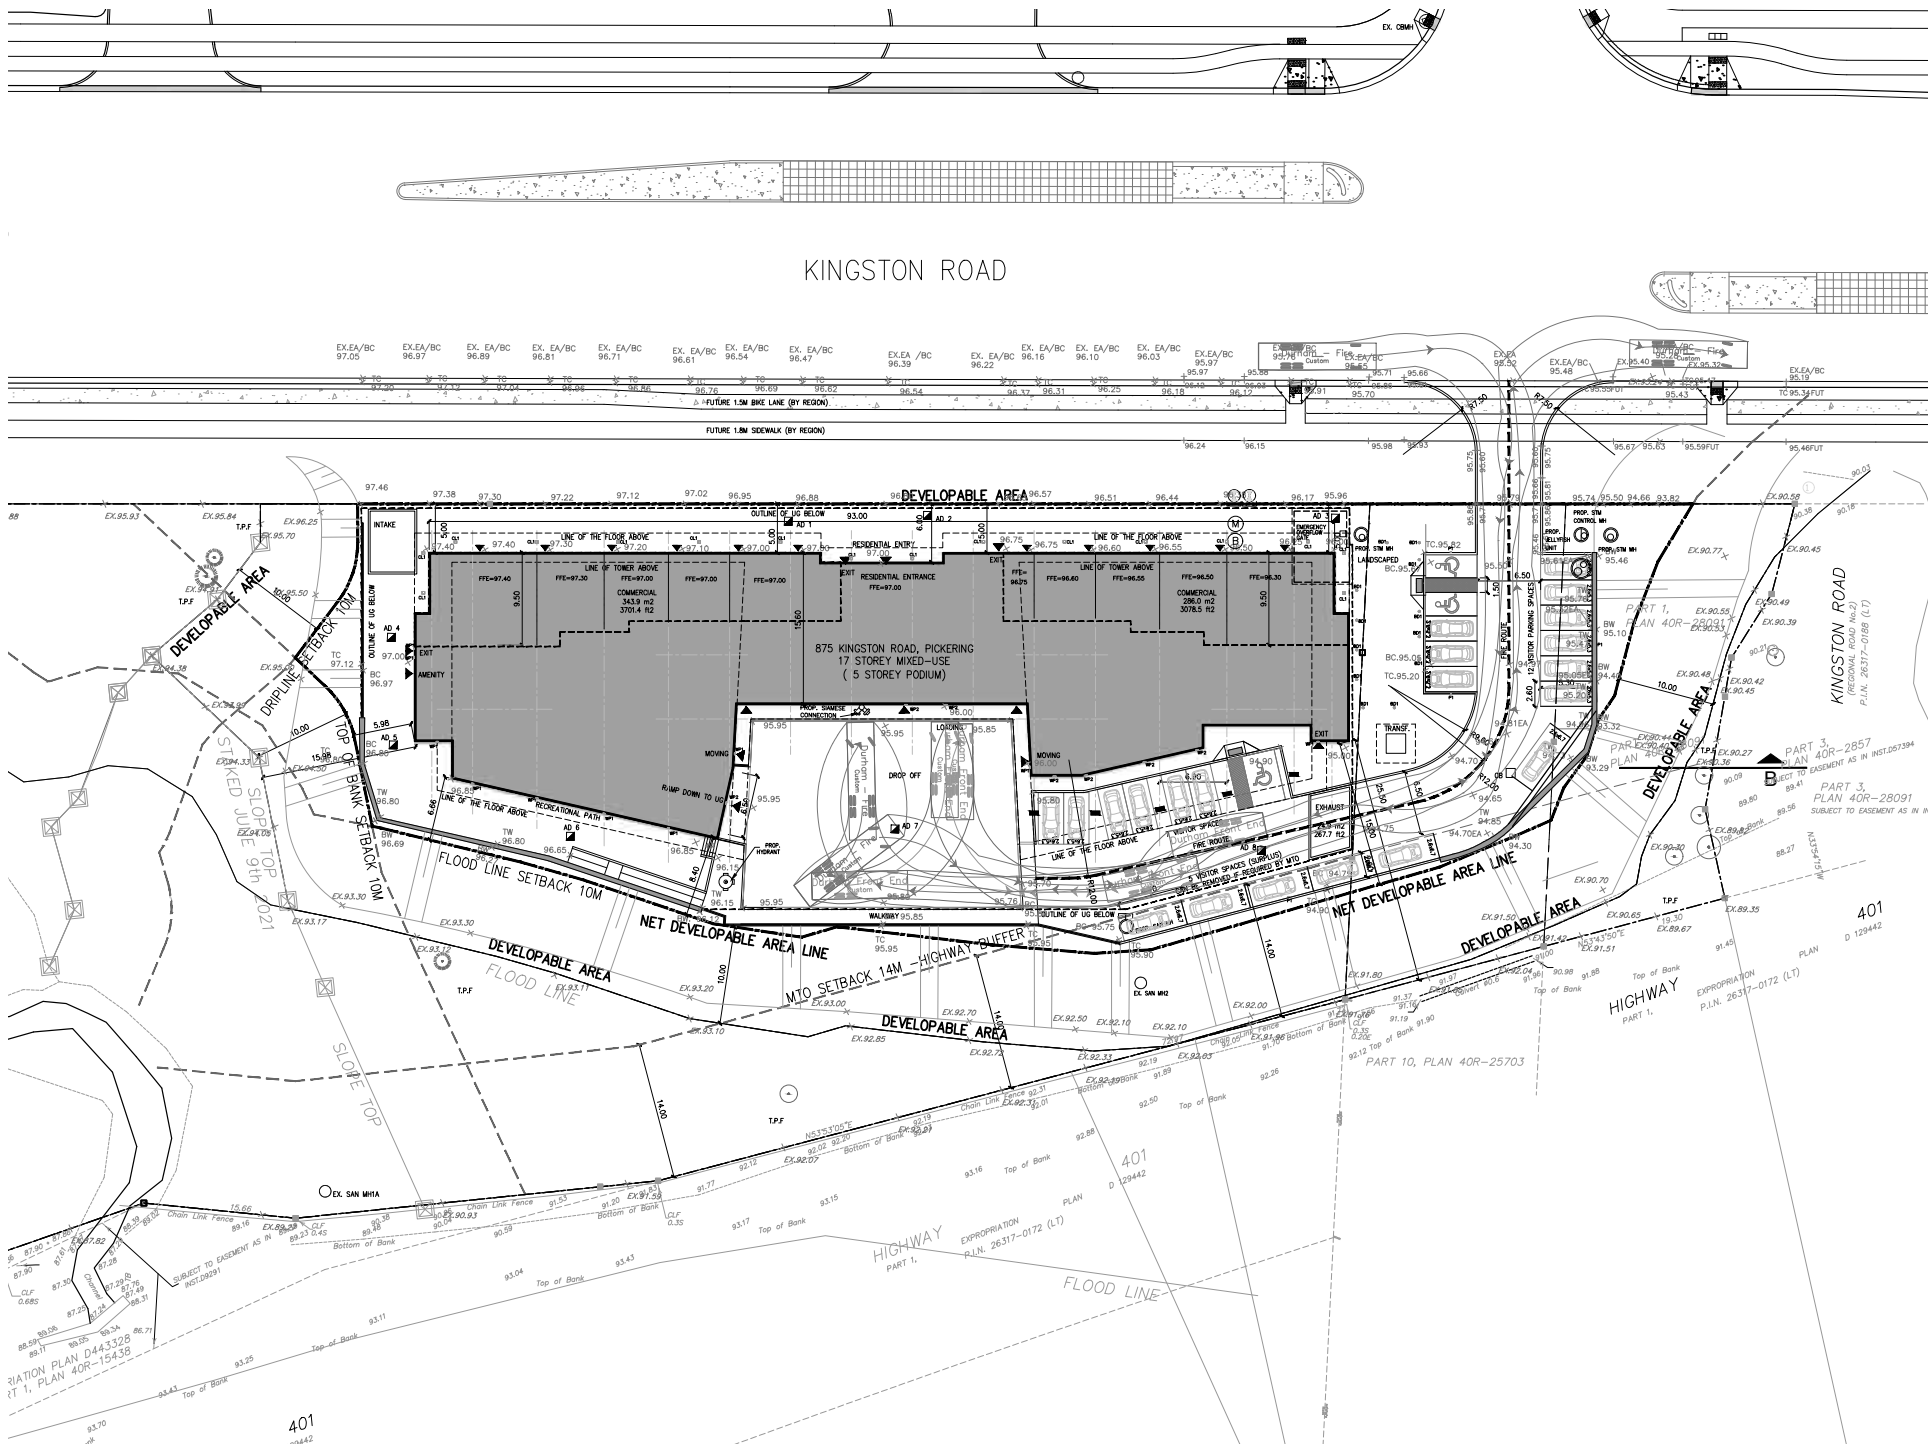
SITE PLAN (ICON ARCHITECTS)
